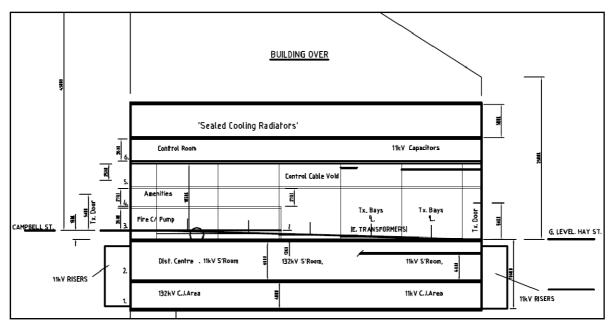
Elevation view of the proposed Belmore Park Zone substation
